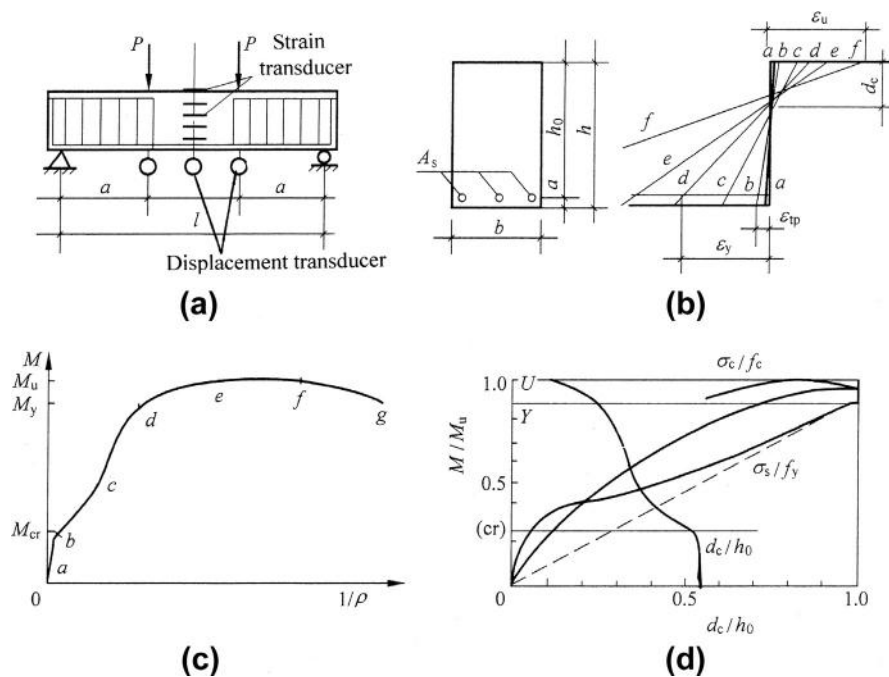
Experiment on singly reinforced concrete beam of rectangular section: (a) specimen and loads, (b) strain distribution, (c) bending moment—curvature relation, (d) stresses of reinforcement and concrete and position of neutral axis
